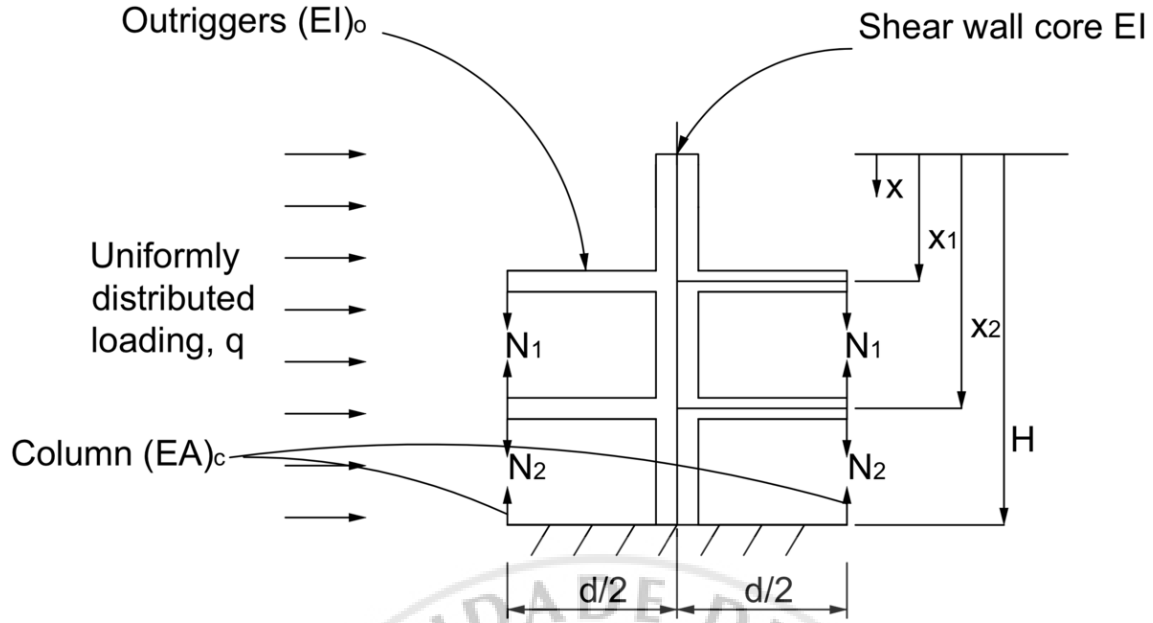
Unknown axial forces in analyzing outrigger-braced structures
